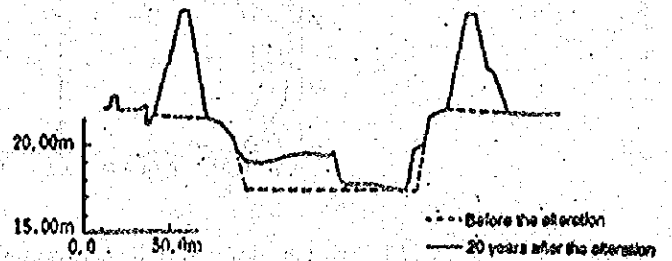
Change in the cross section profile at a typical point in section (2)
